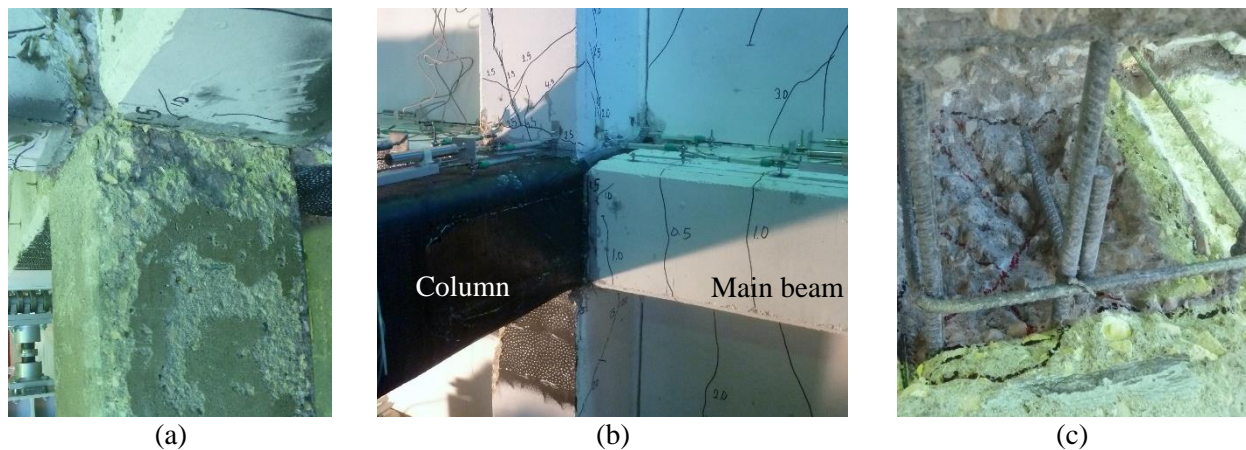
Final damage state in C1-RT-A-sw: (a) No cracks in column after removal of FRP; (b) early cracks in main beam; (c) damage in joint visible after removal of transverse beam
